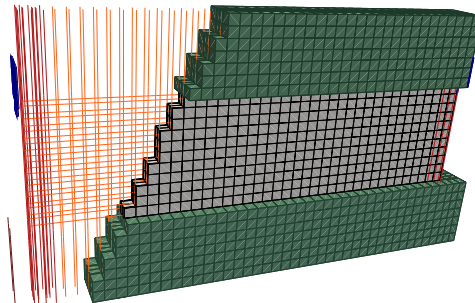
Finite element mesh used for the reinforced concrete shear wall.
